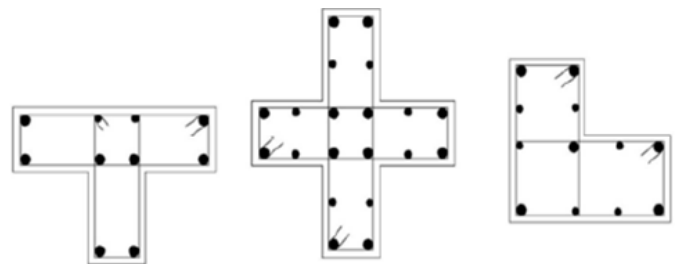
Specially shaped (T, +, Plus) columns with Longitudinal and lateral reinforcement.
